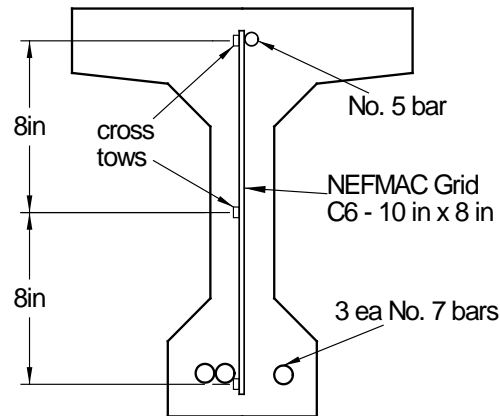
Cross-Section of Specimen 5 Minimum NEFMAC Reinforcement
